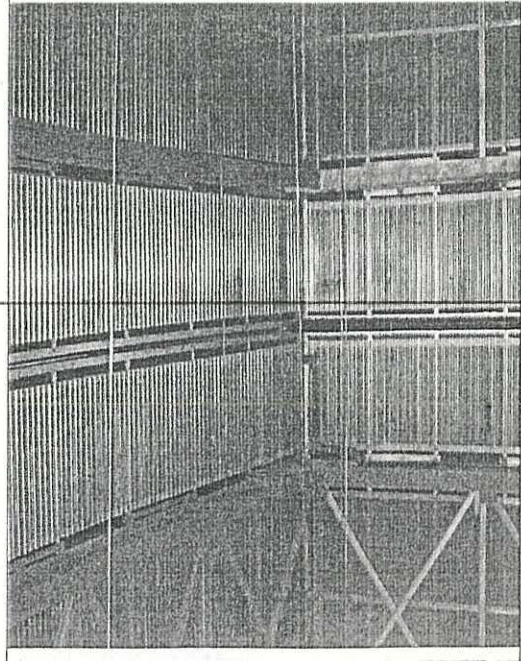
Gap was Filled Inside Enclosure (Roof)
